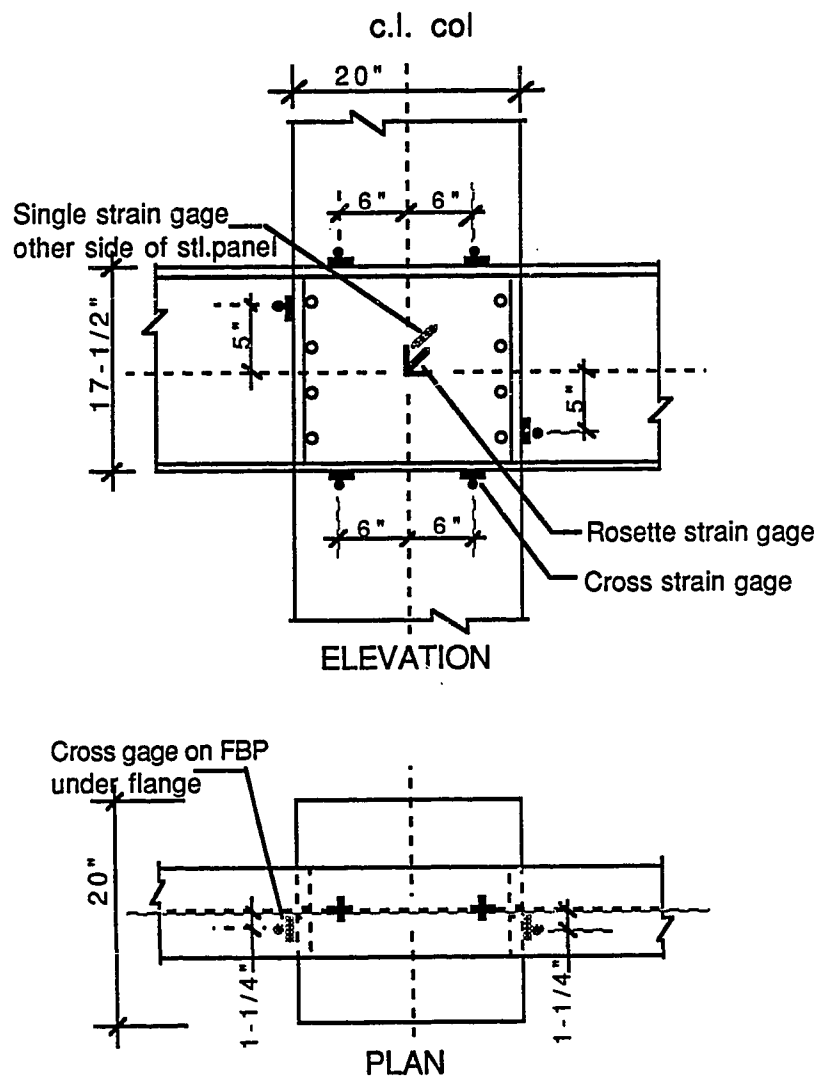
Instrumentation on beam for specimens 3 thru 9.
